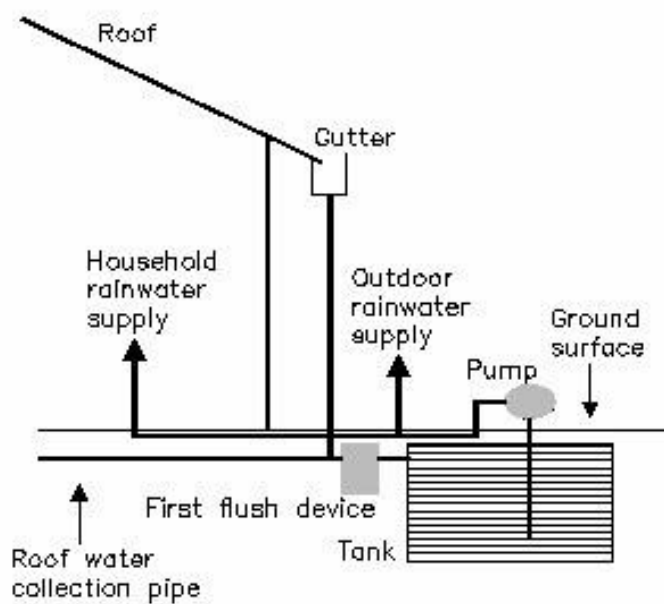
TYPICAL BELOW-GROUND RAINWATER SYSTEM
